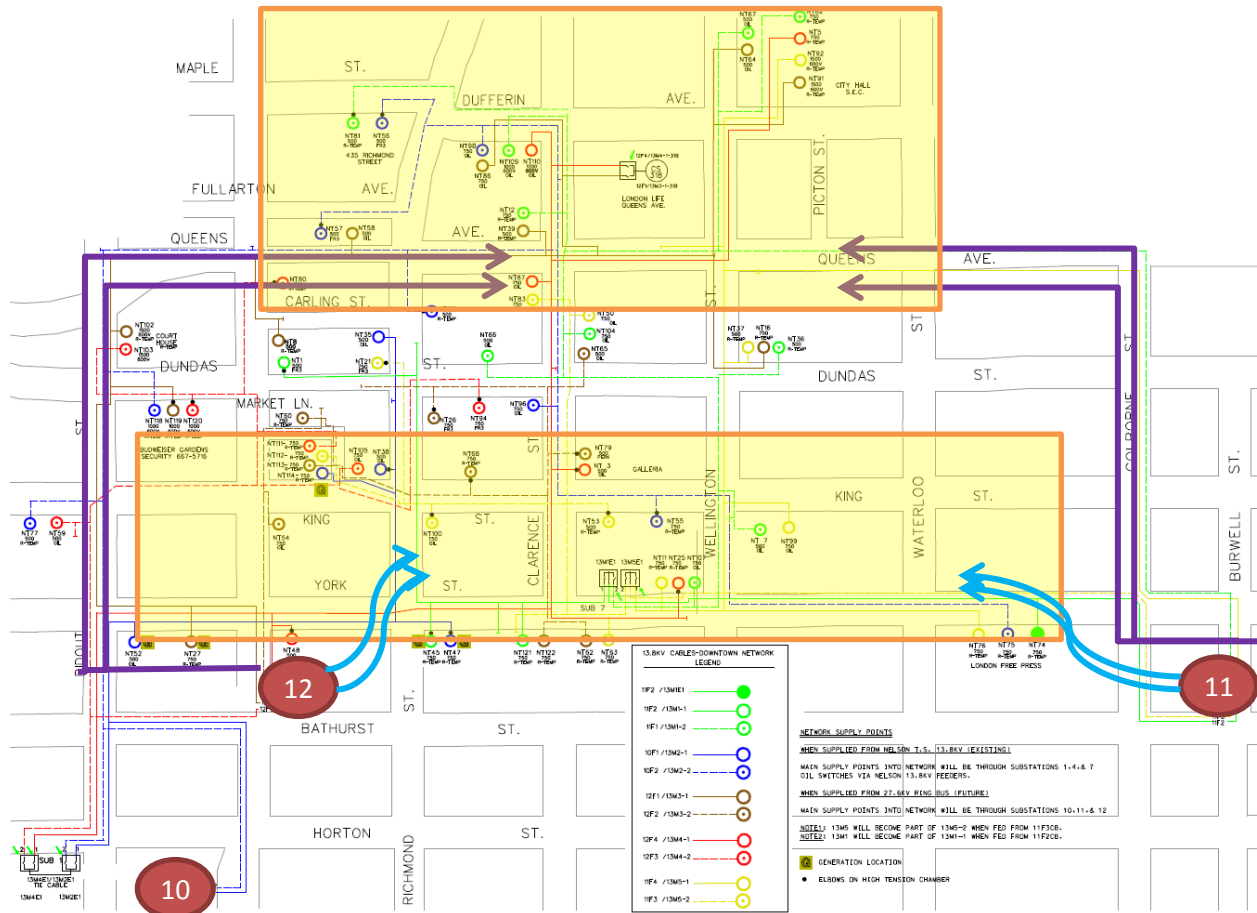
13.8kV Supply to North and South Grids Plan Drawing
